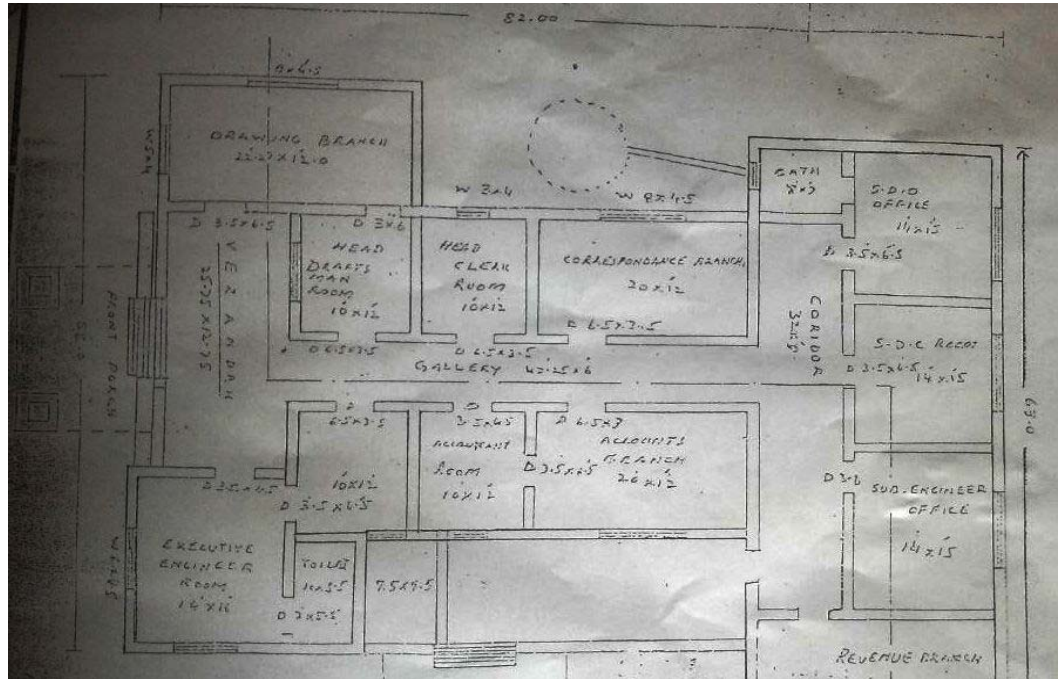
Elevation, sides and layout of building of Kirthar Canal Division
